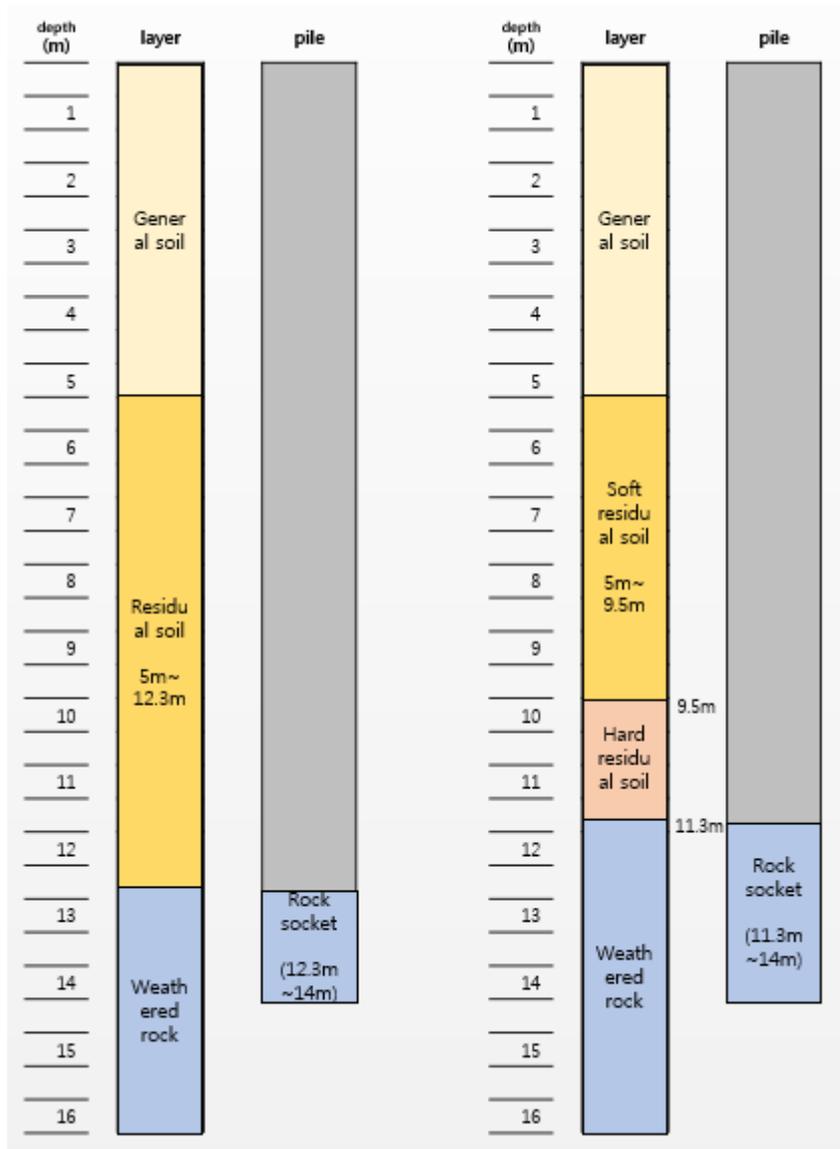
Section view of the subsurface layer for pile No. 5 before and after Modification
